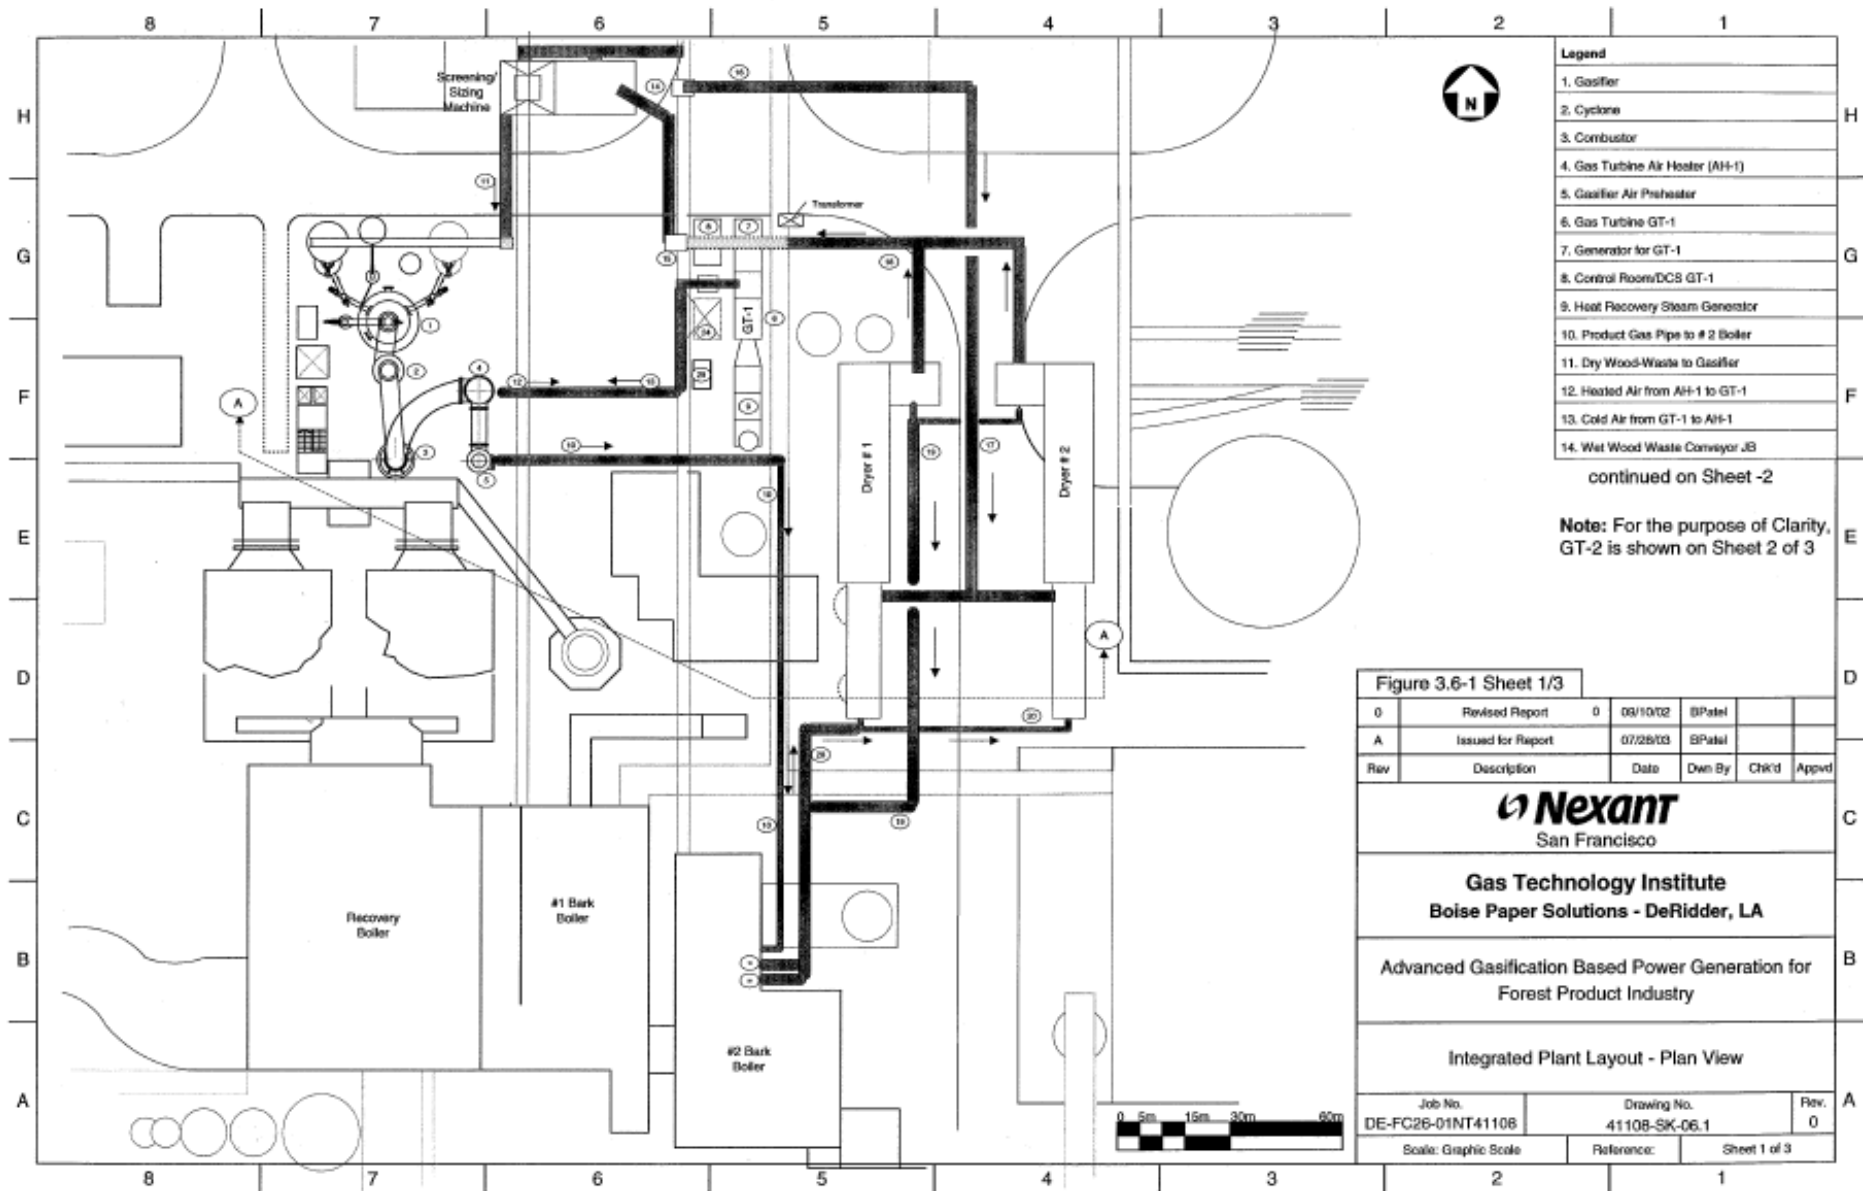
Integrated Plant Layout - Sheet 1
